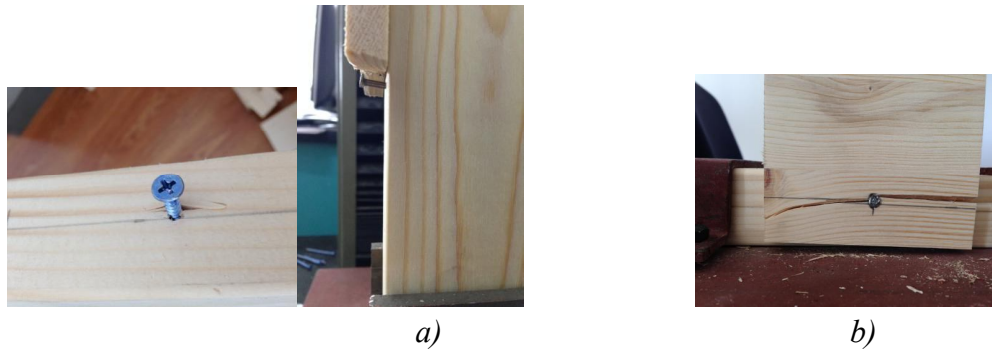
Failure modes of the joints with SPF sheathing: (a) bending of fastener, (b) brittle failure of SPF sheathing panel.
